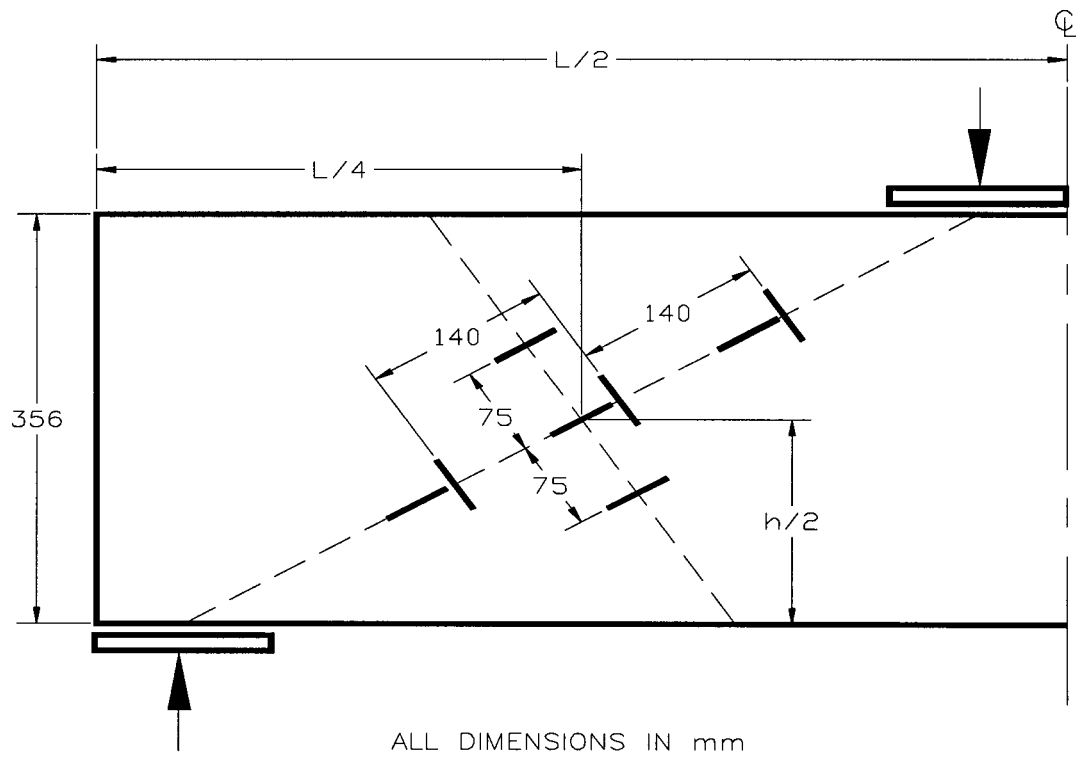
Locations of strain gauges placed on steel reinforcement.
